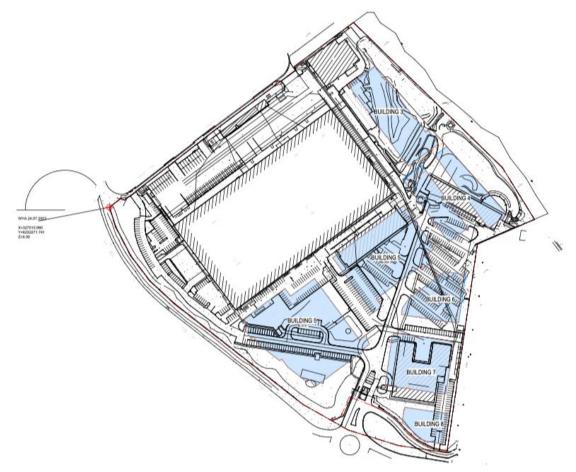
Existing and Proposed Building Overlay (Watson Young)
